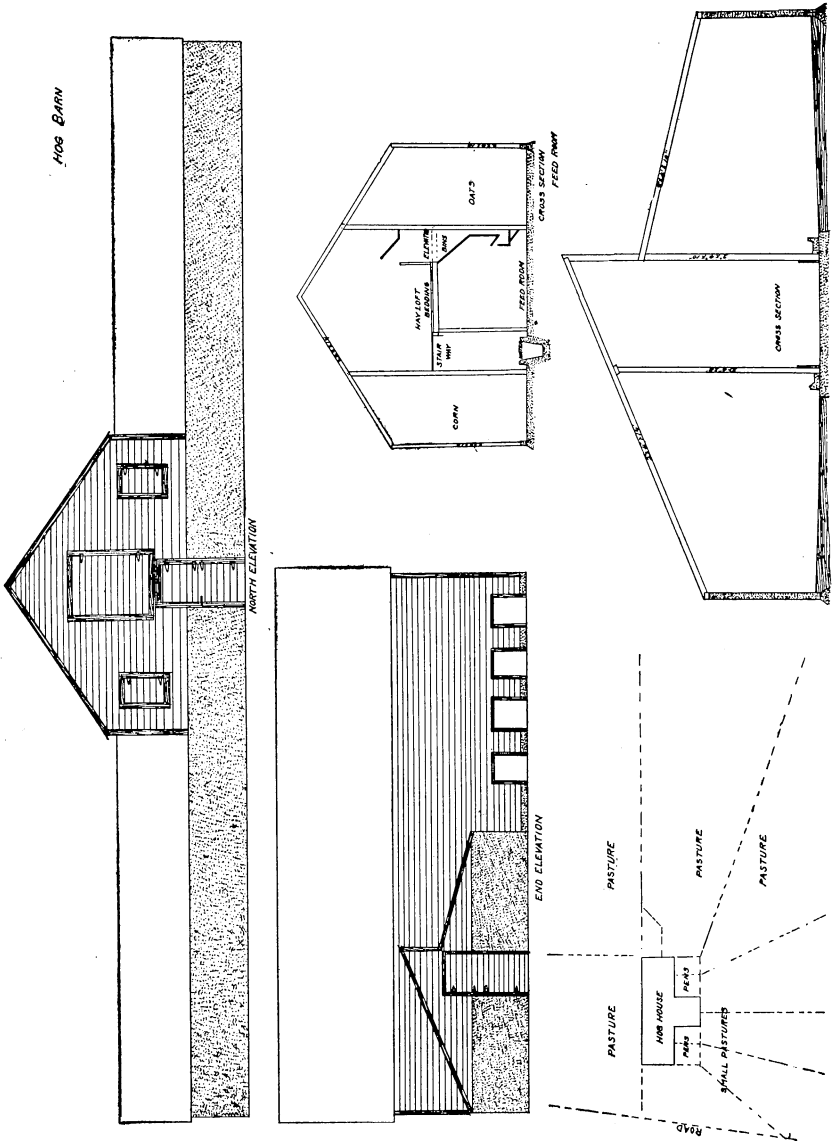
Cross sections and elevations of house shown in figure 11.
